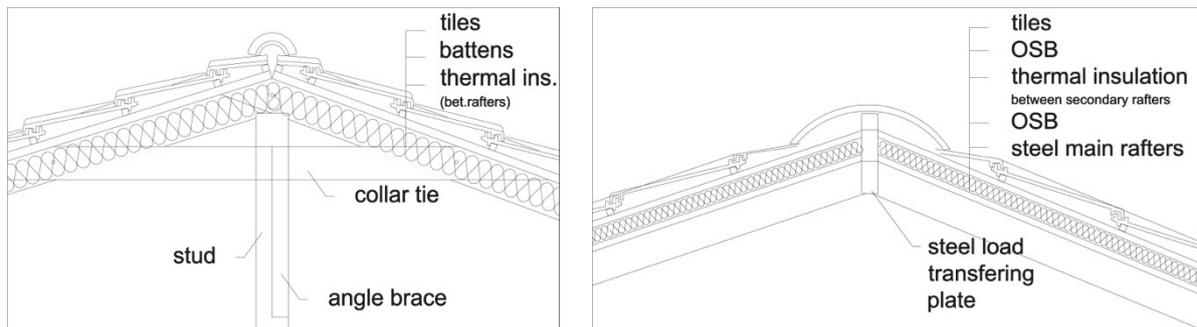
(left) section of the wooden roof; (right) section of the steel roof (Source: Author).
